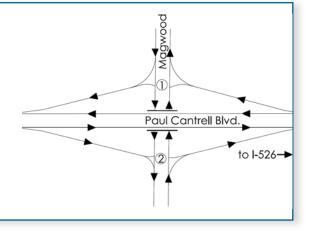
Paul Cantrell Boulevard at Magwood Drive Alternative 1
